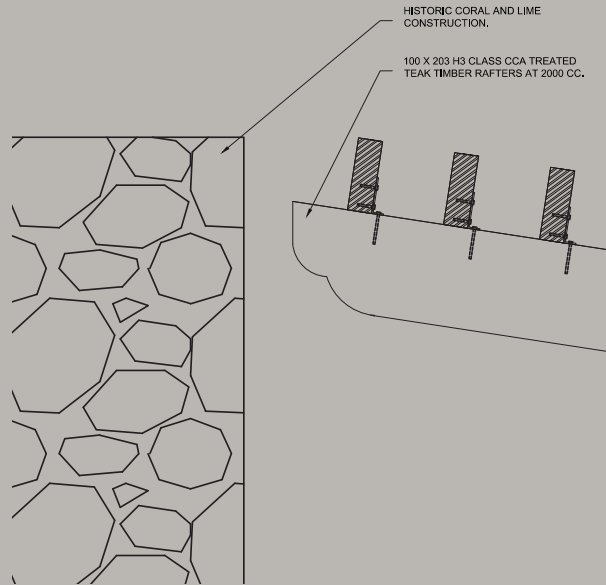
Detail Section (1:10) of I-beam/Ruins meet
